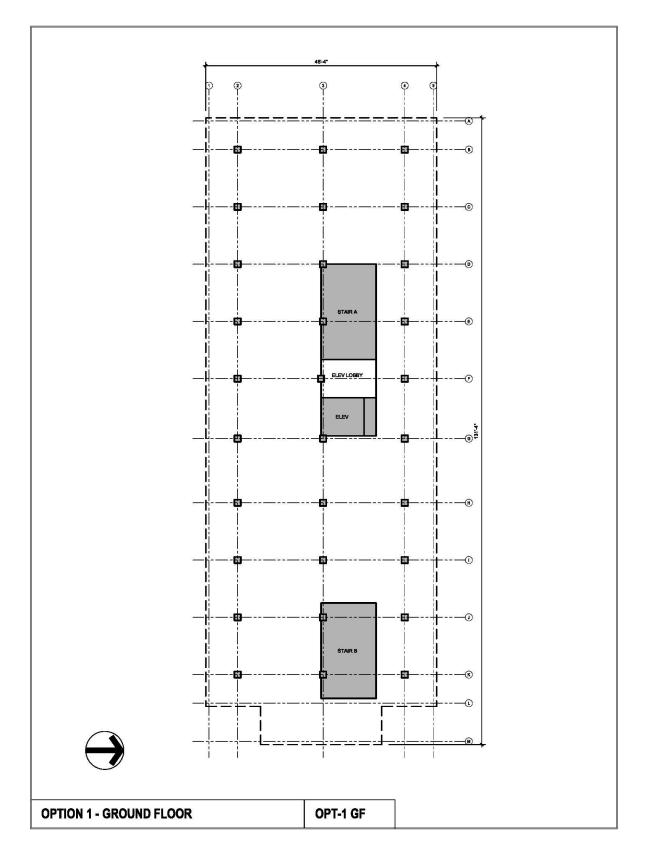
Pre-Design Building Option 1 - Ground Floor
